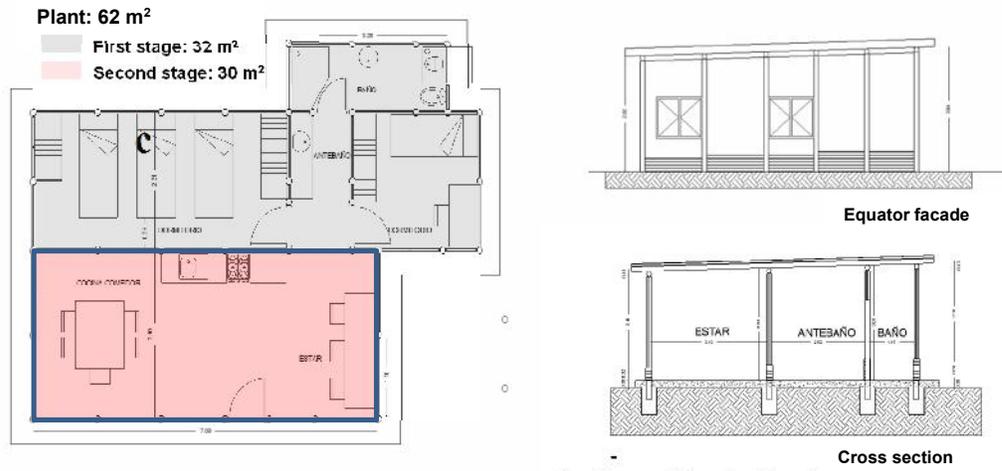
Plants of 1° and 2° Stage, Cross Section and Equator Facade.
